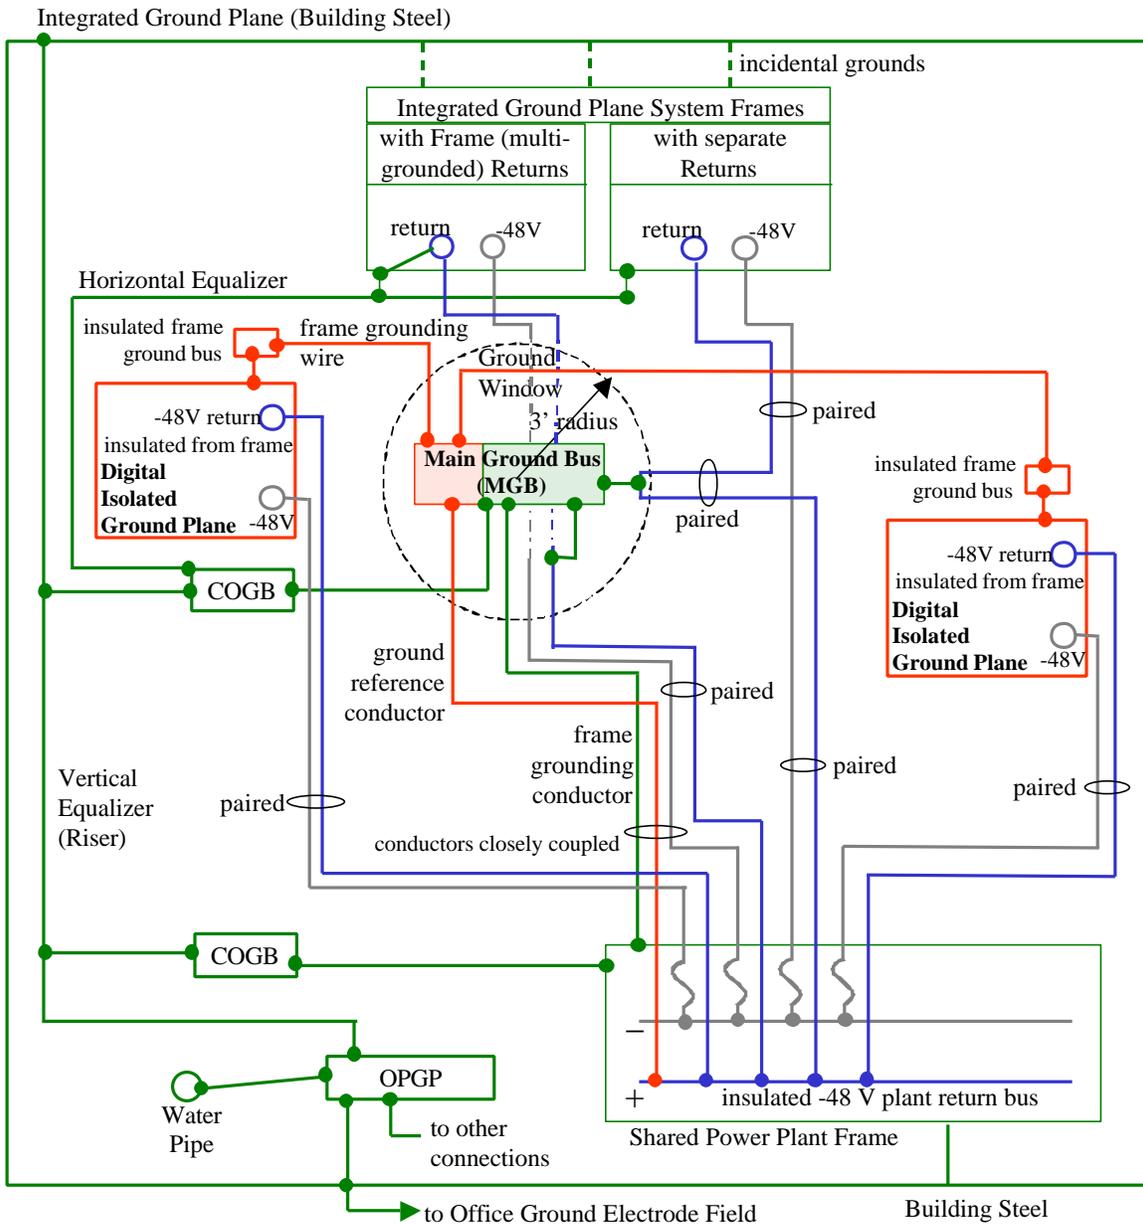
Grounding For Integrated and Isolated Ground Planes Powered From Common Power Plant
